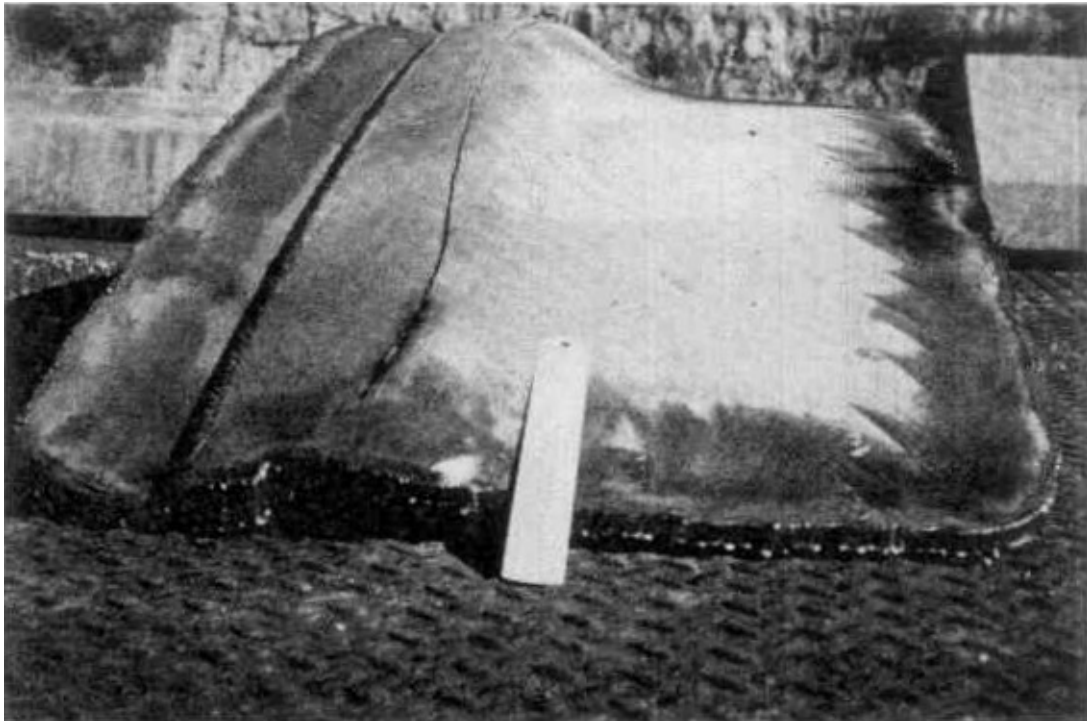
Photo Showing Removed Section of Pipe Wall with a 1.5-m-Split at
